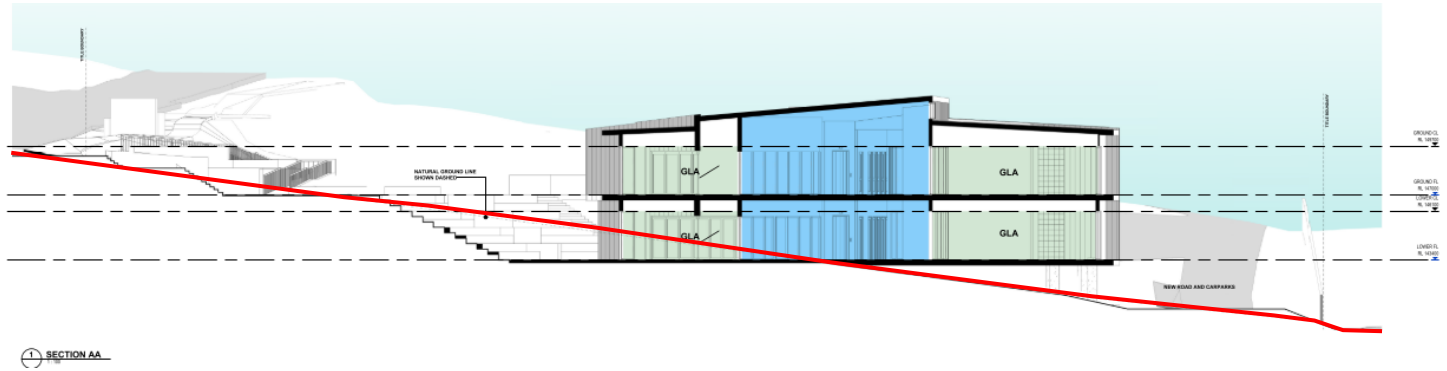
An east-west section (section A-A) through the building showing its relationship with the natural ground level (outlined in red)
